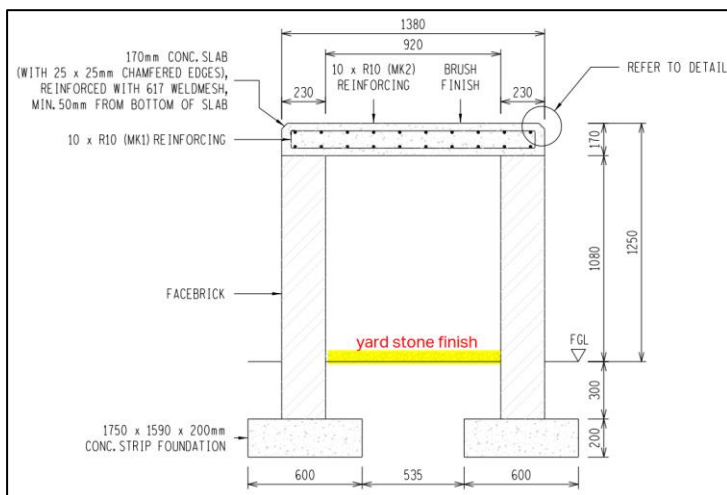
Excerpt showing the protected corner/edge detail of exposed external concrete slabs
